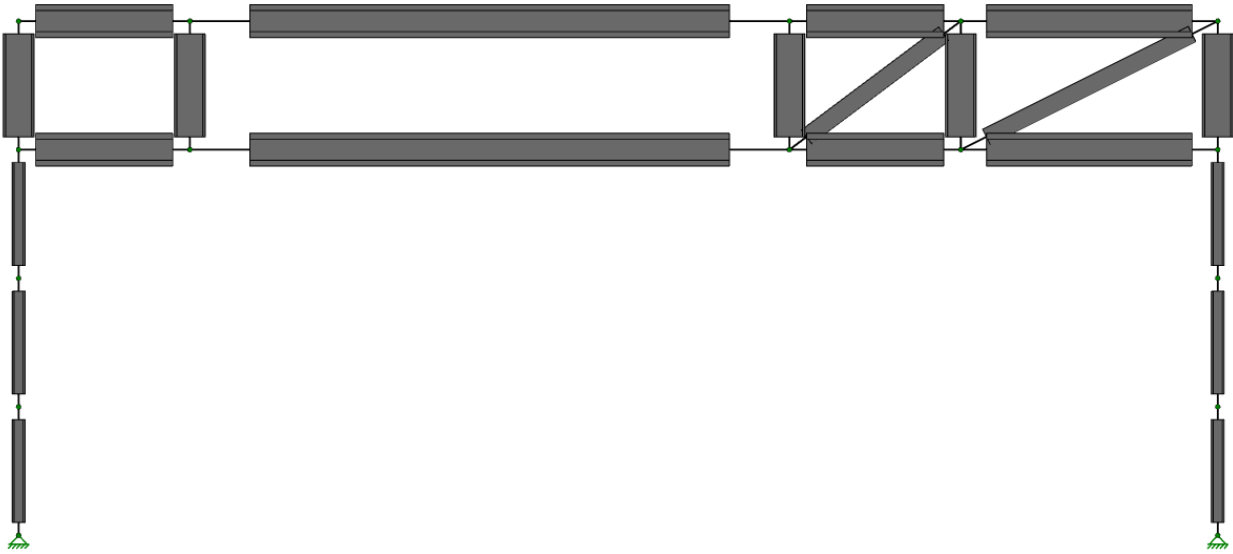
Row 7 Frame with Supporting Columns to the 1st Floor. Final Column Size was W14x370, and each was 15 feet tall ($L_c=15$ feet)
